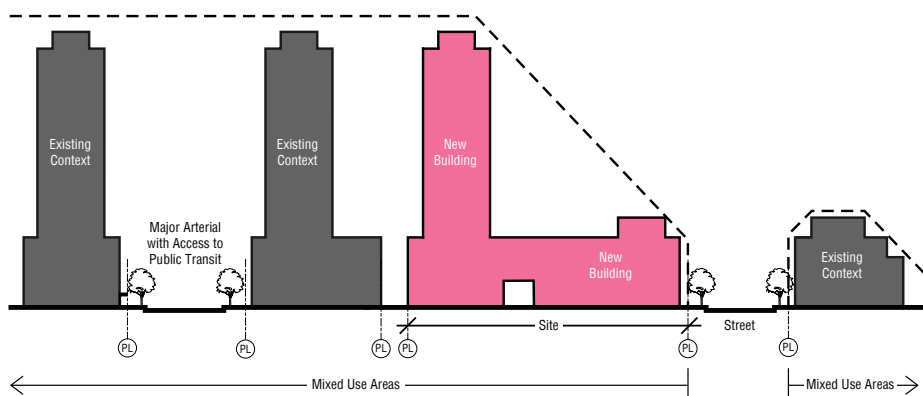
A conceptual illustration of an angular plane and direct relationship in base building height and form to support tall building transition down to a lower-scale area.
